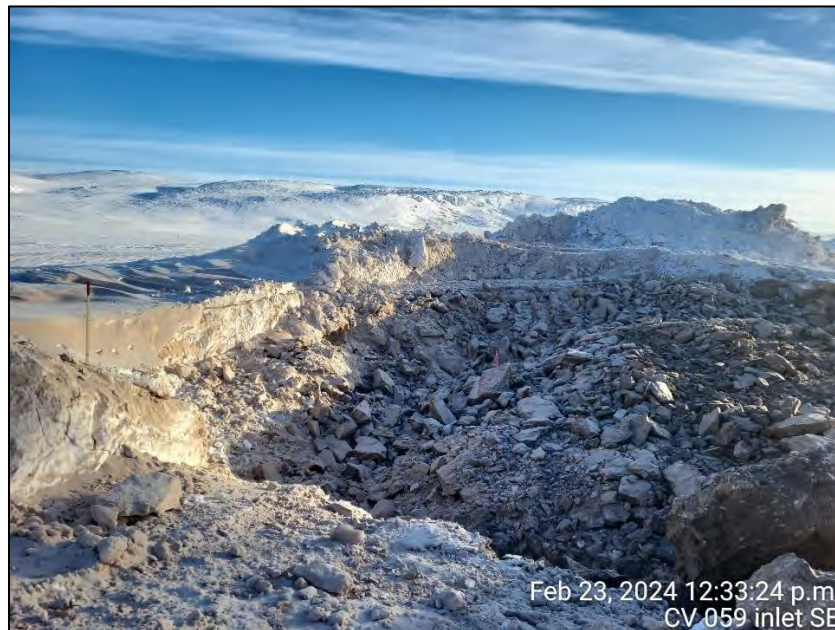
During Construction - Vantage Point 1 - Blasted upstream side of crossing - looking southeast (February 23, 2024).
